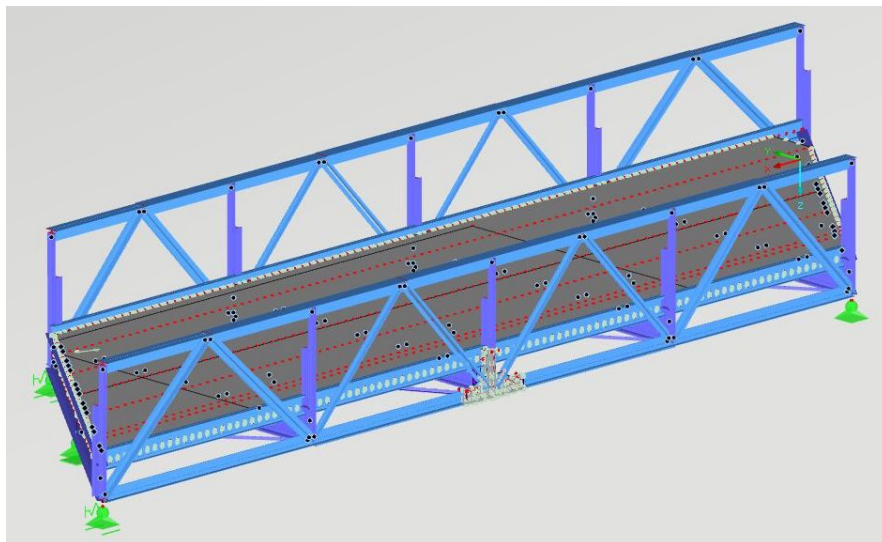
Unstrengthen Bridge Model with Detailed Connection.
